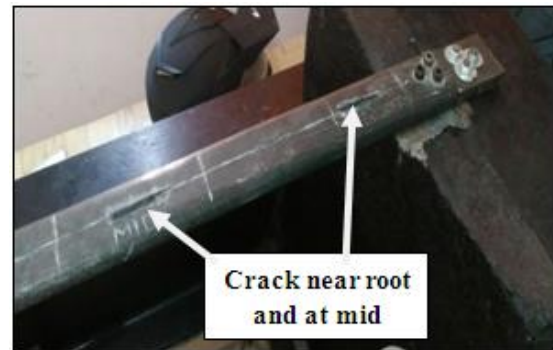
Damaged beam by producing crack near root Figure 4: Damaged beam by producing crack at mid
